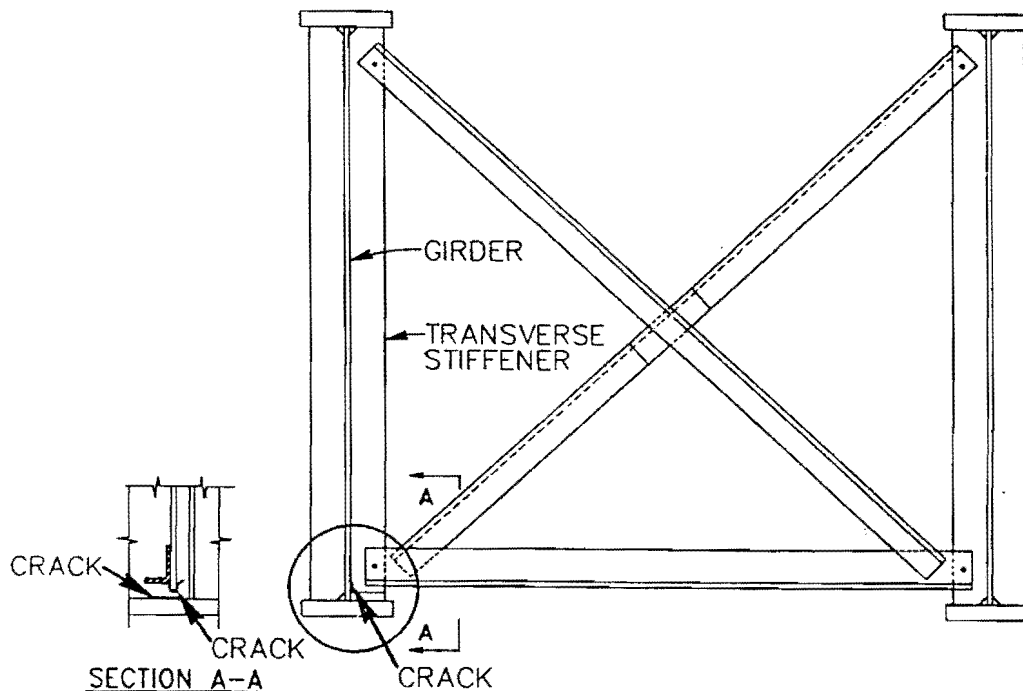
Location of Type A1 fatigue cracking.
